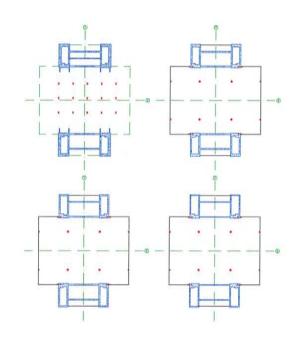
Torre Caja Madrid with typical floor plan of basement, low-, mid- and high-rise section
